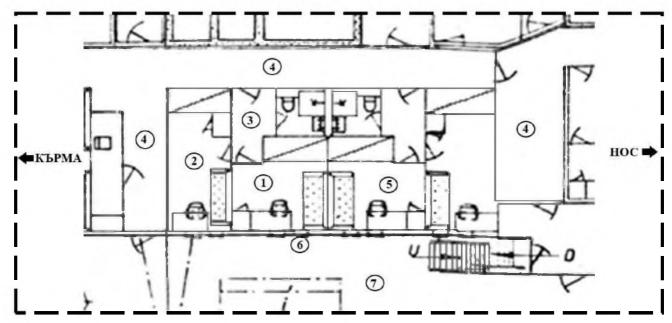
A part of the cabin plan on the first bridge deck s/b side 1,2,3 - Cabin of the seamen/messmen / 1 and 2 - Bedrooms, 3 - Antechamber; 4 - Corridor; 5 - Cook's cabin; 6 - Place of hot works; 7 - Deck.
